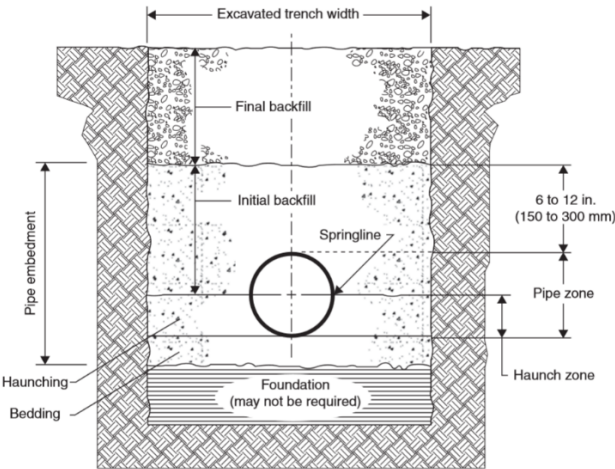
Typical cross-section of an underground pipeline installation for flexible pipe (Open-Cut). (Source: ASTM D2321, 1989.)
